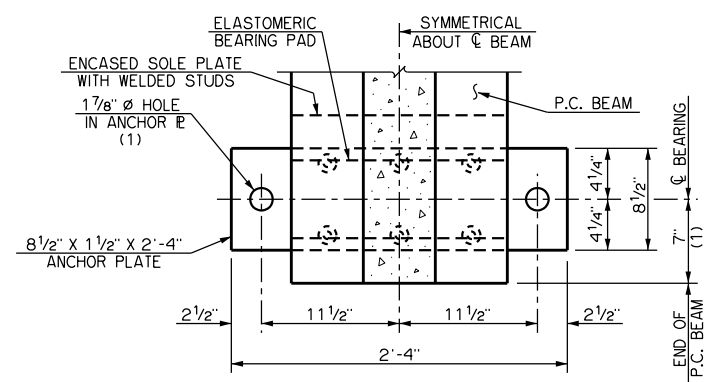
DETAILS OF BEARING ASSEMBLY WITHIN SPAN NOS. 2 AND 3
